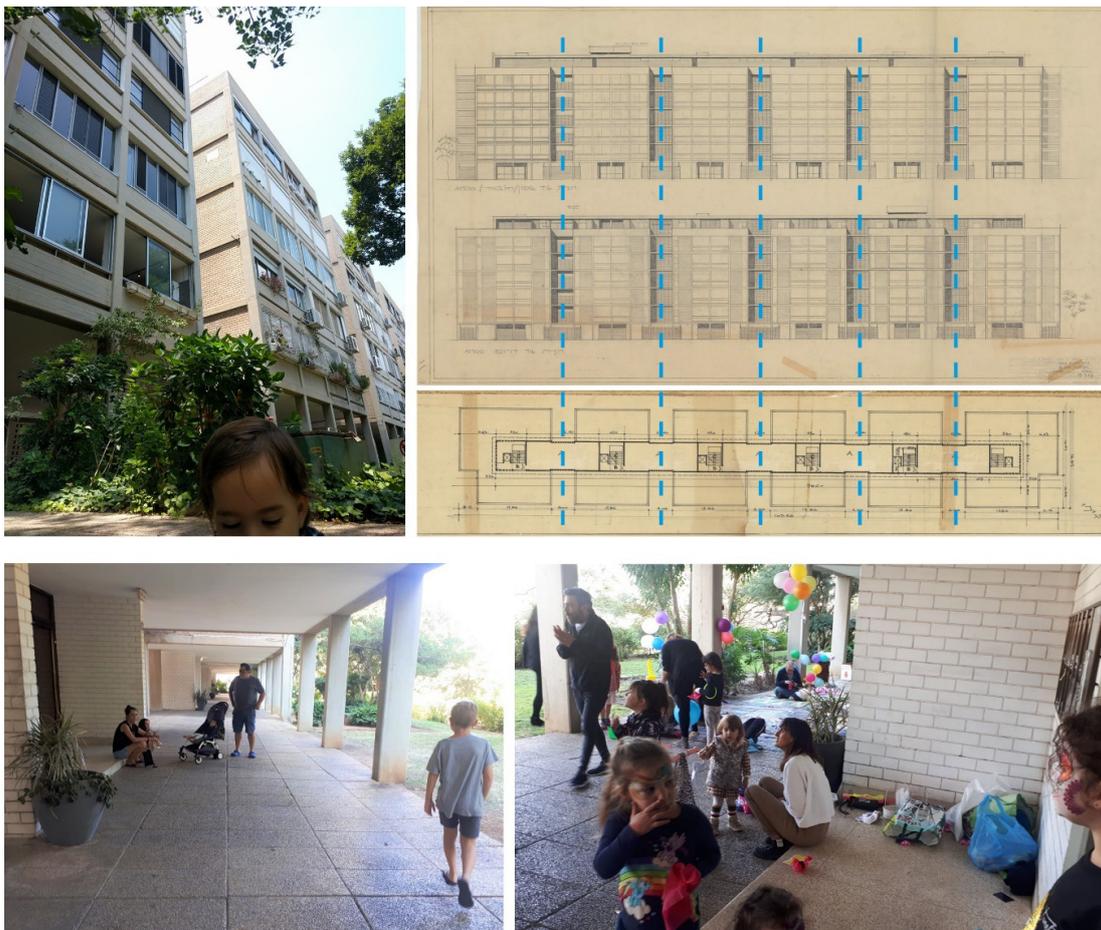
Facades and roof plan of one of the elongated buildings (40–50 Be'eri street). Note in the facades the recessed service balconies (dark grey) shaping the large building as a series of separate-looking volumes. Top: the facades' drawing, 1963; Bottom: roof plan, unknown year, with graphic additions by the authors. The building's design as a series of separate-looking volumes softens the large building's massiveness and produces a colonnade with extensive thresholds for each entry. Sources: A. Sharon (1963); photos by the authors.
